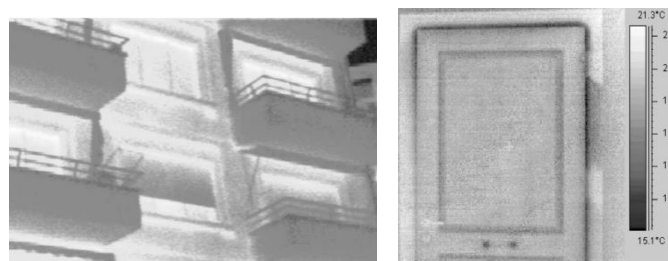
left: Thermography of a building façade illustrating missing wall thermal insulation and thermal bridges; right: thermograph of an exterior door viewed-Air leakage through door
